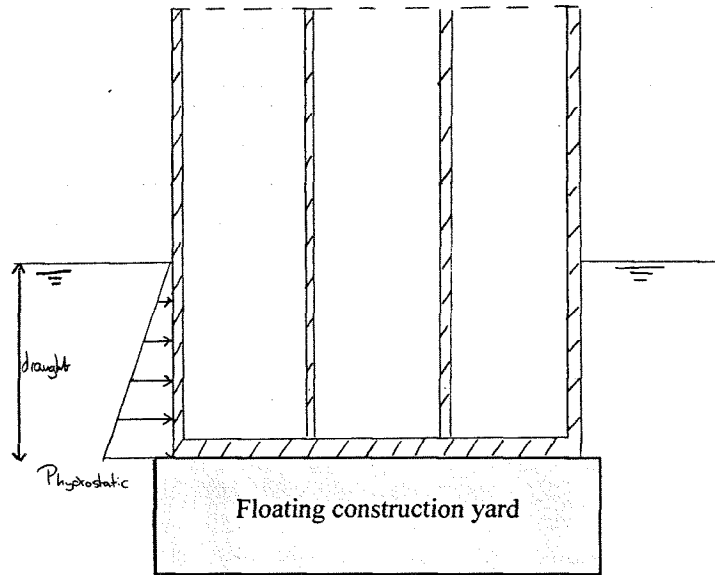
Hydrostatic forces on outer walls during construction phase.
